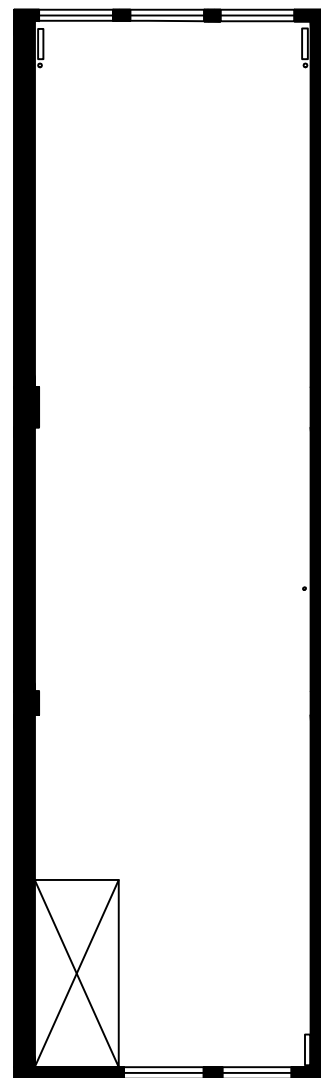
284 William Avenue: Site Plan. (Sosa Fontaine, 2010).
